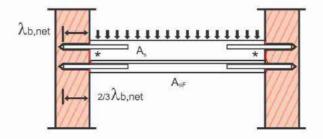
Anchoring of reinforcement to cover the line of acting tensile force.
